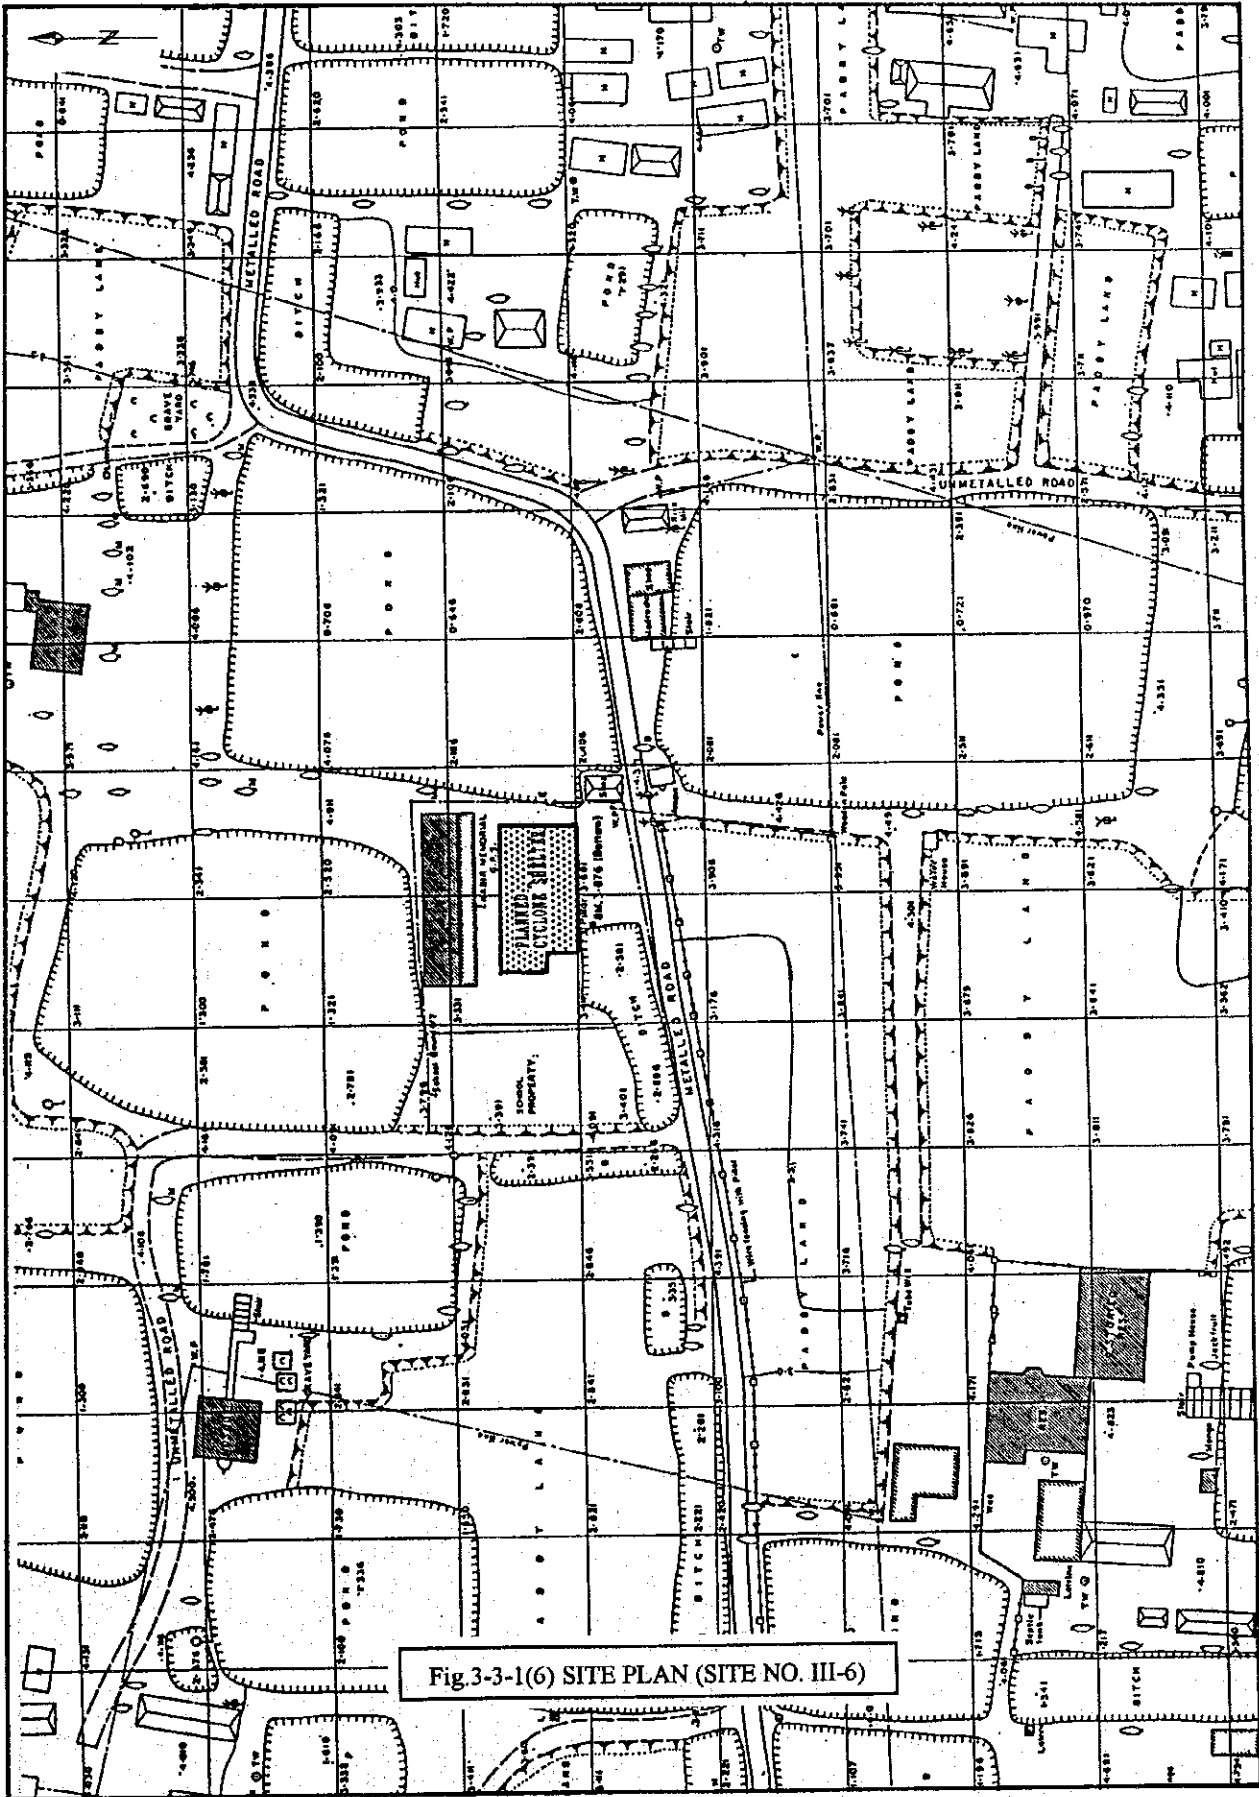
(6) SITE PLAN (SITE NO. III-6)
